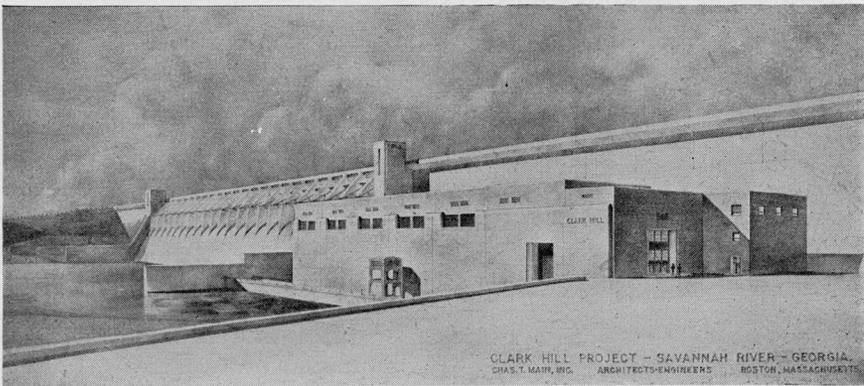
DRAWING OF CLARK HILL DAM AND POWERHOUSE.
